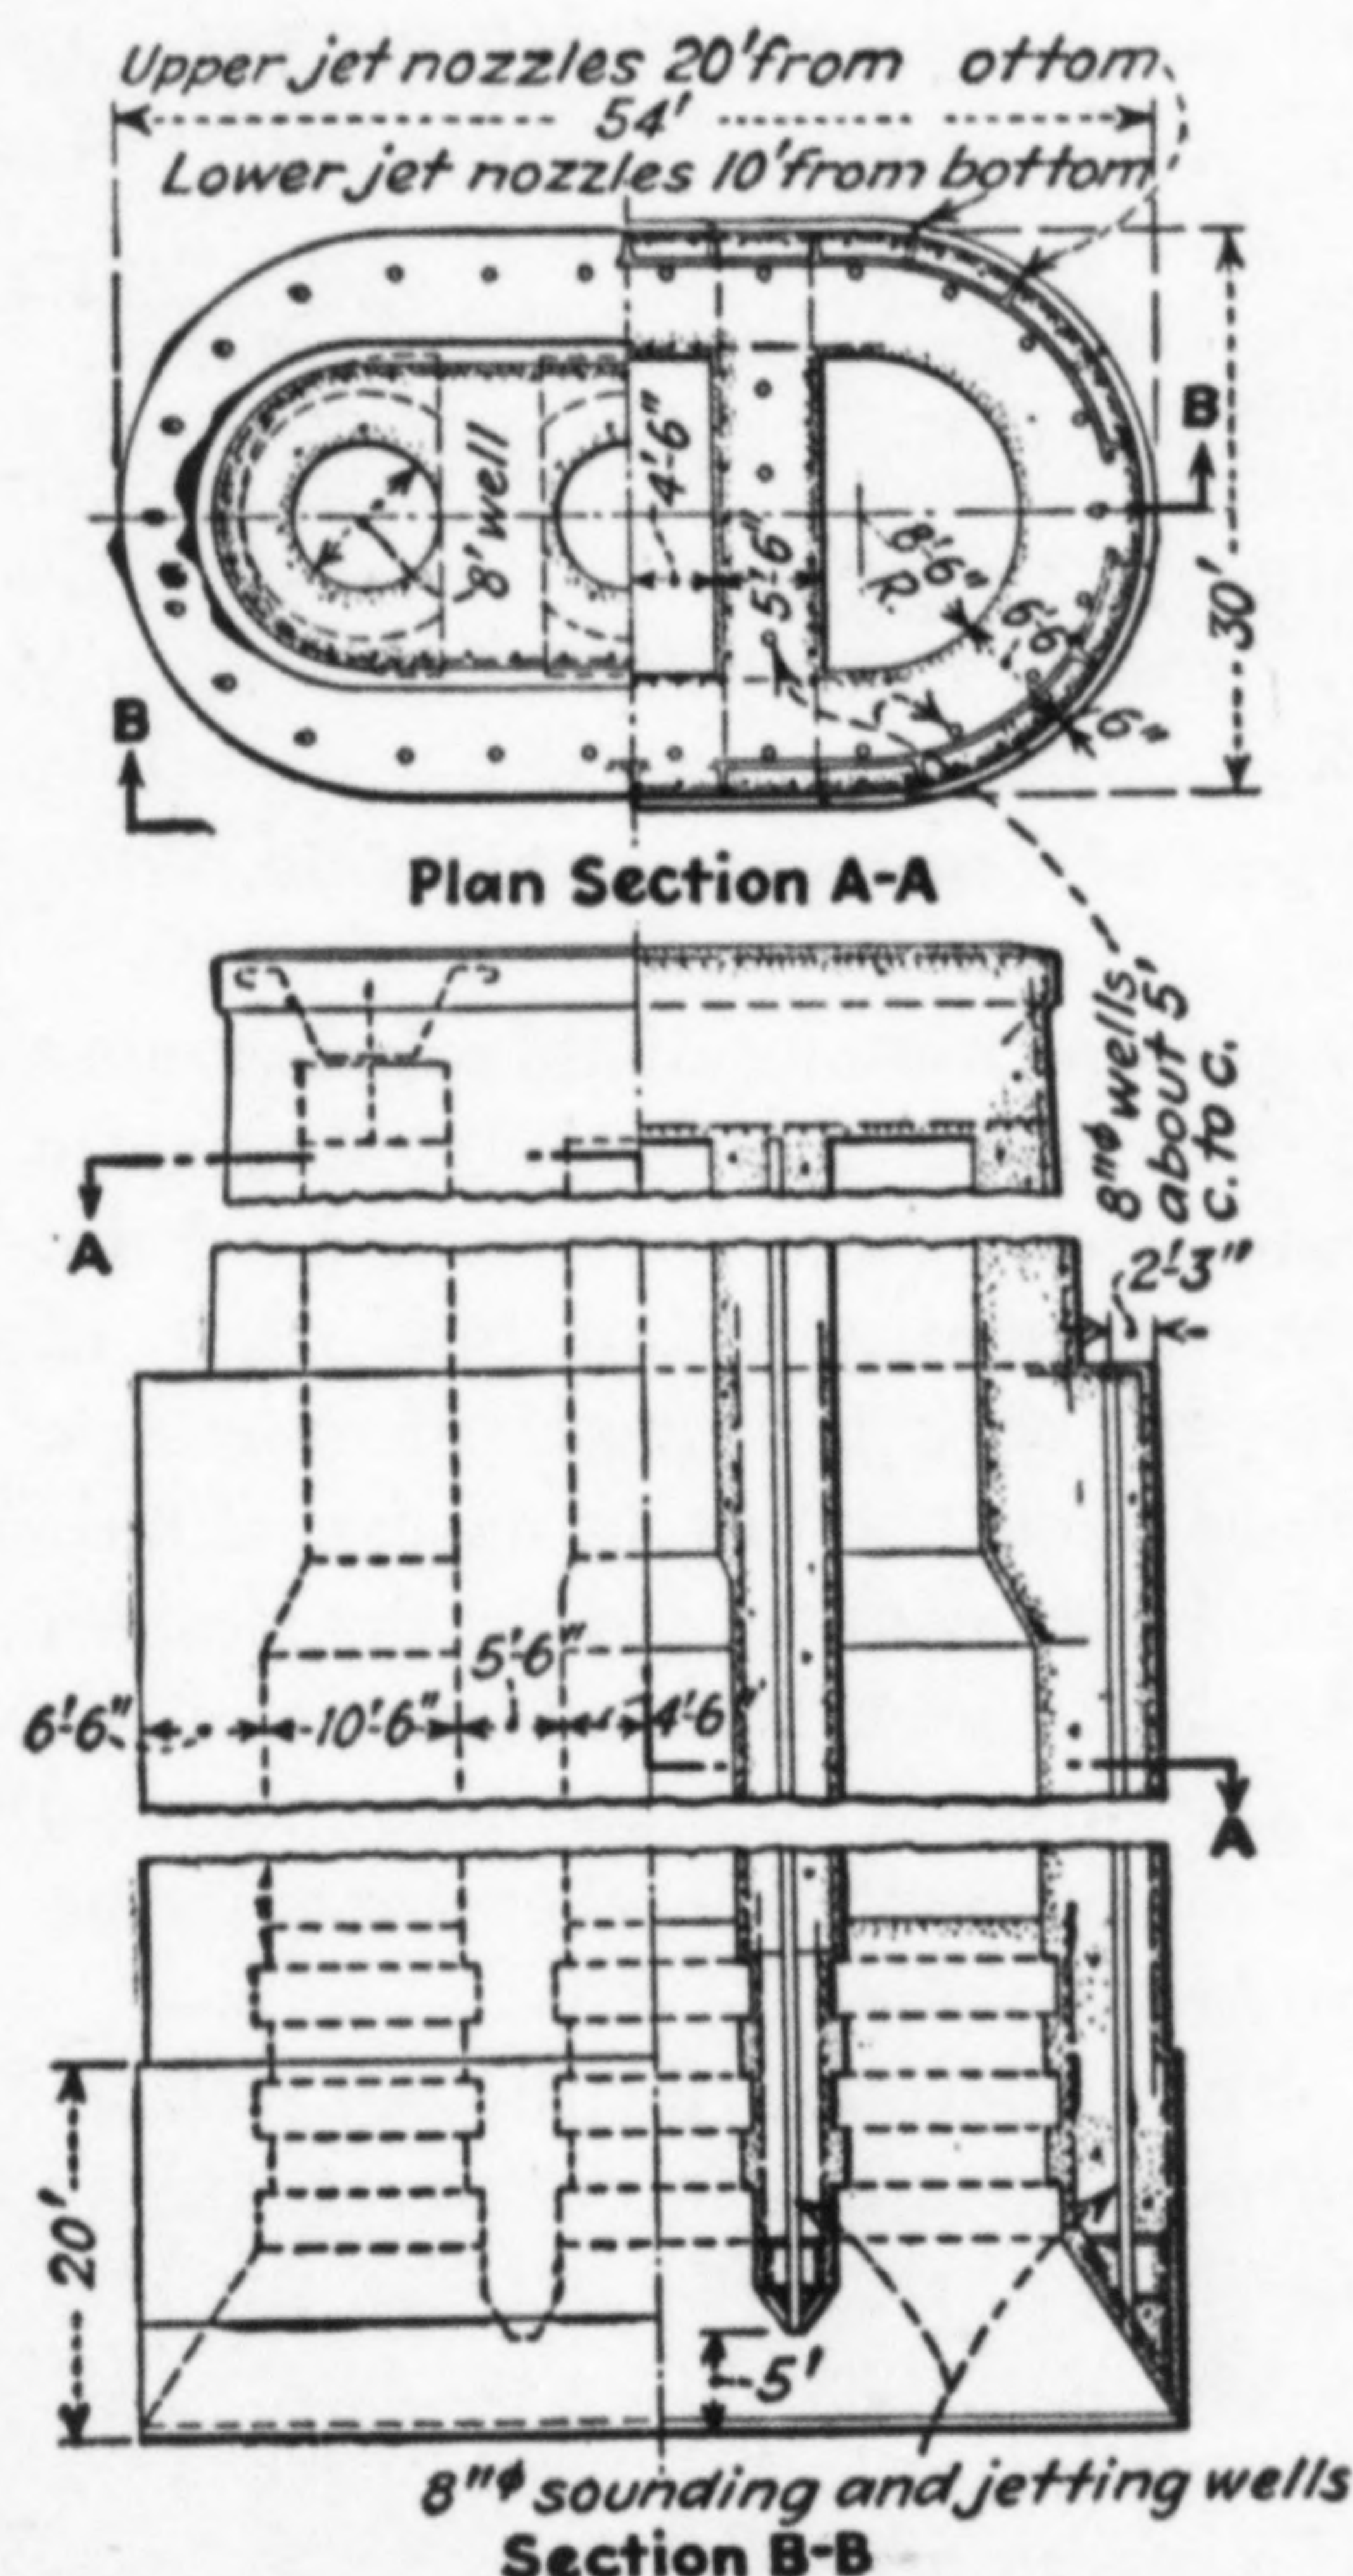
Details of new deep caisson piers notable for their jetting systems and three dredging wells.
